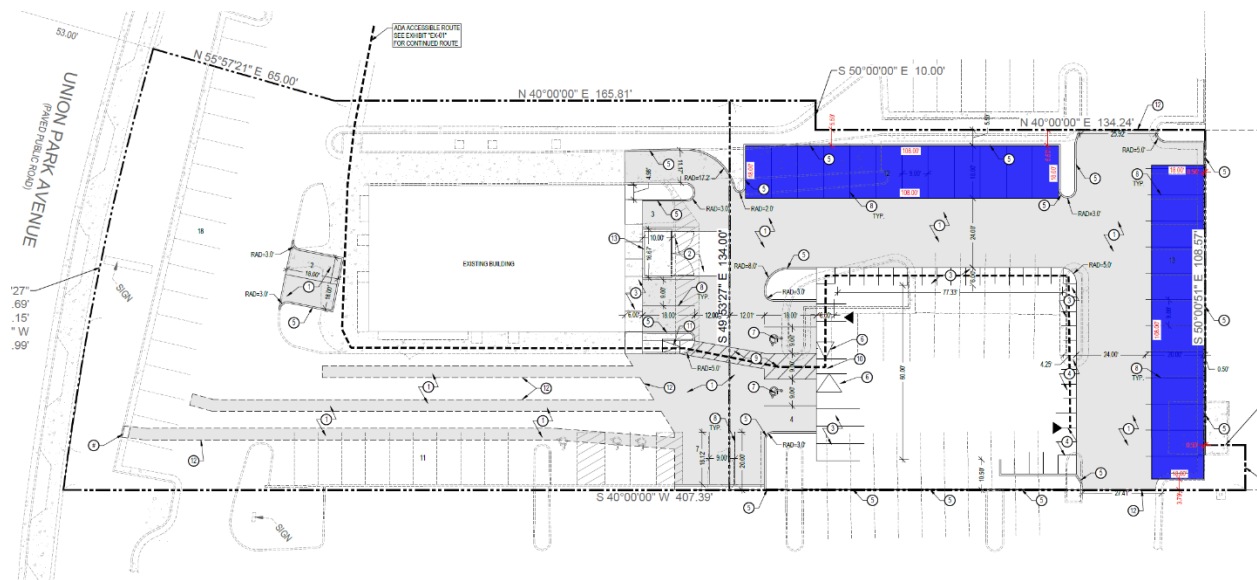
Conceptual Site Plan - Solar Carports Shown in Blue
